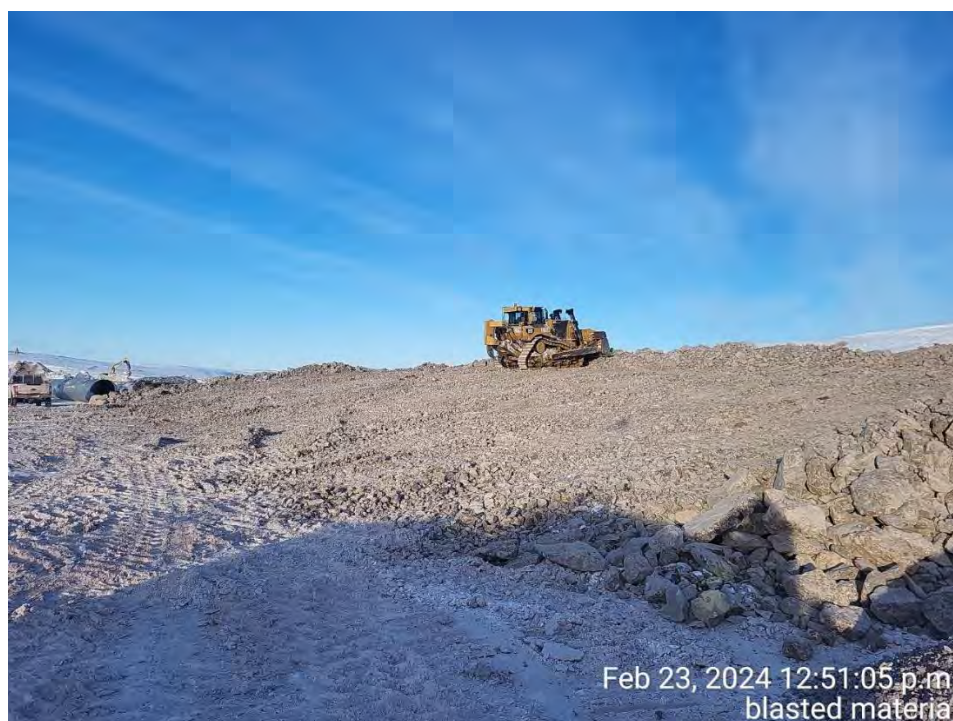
Looking northeast at the blasted material stockpile at km 60 (February 23, 2024)
